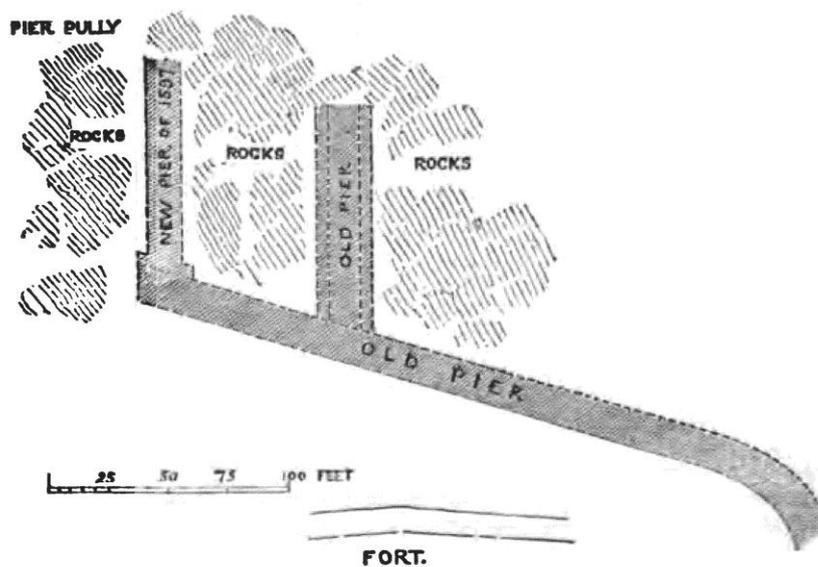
, Plan of pier remains, from (Cooper & Ross 1862, 94) (North to bottom)
